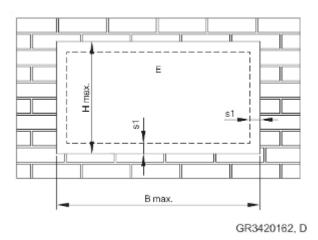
Fire batt – installation in solid walls and ceilings, lightweight partition, timber stud wall, half-timbered construction and solid wood walls
